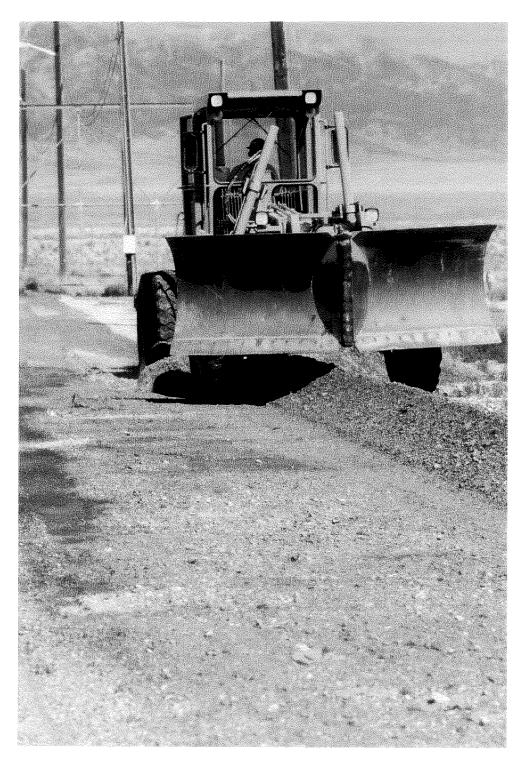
Contaminated TSF-06 Area B overburden scraped in thin lifts into a row for soil bag loading, June 2000.
